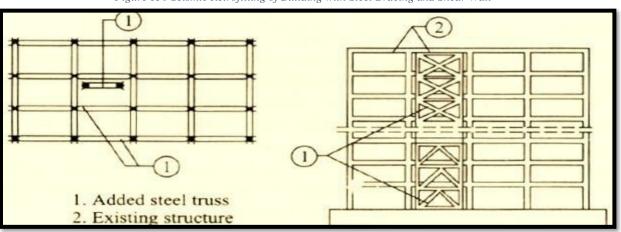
Seismic Retrofitting of Building with Steel Bracing and Shear Wall
